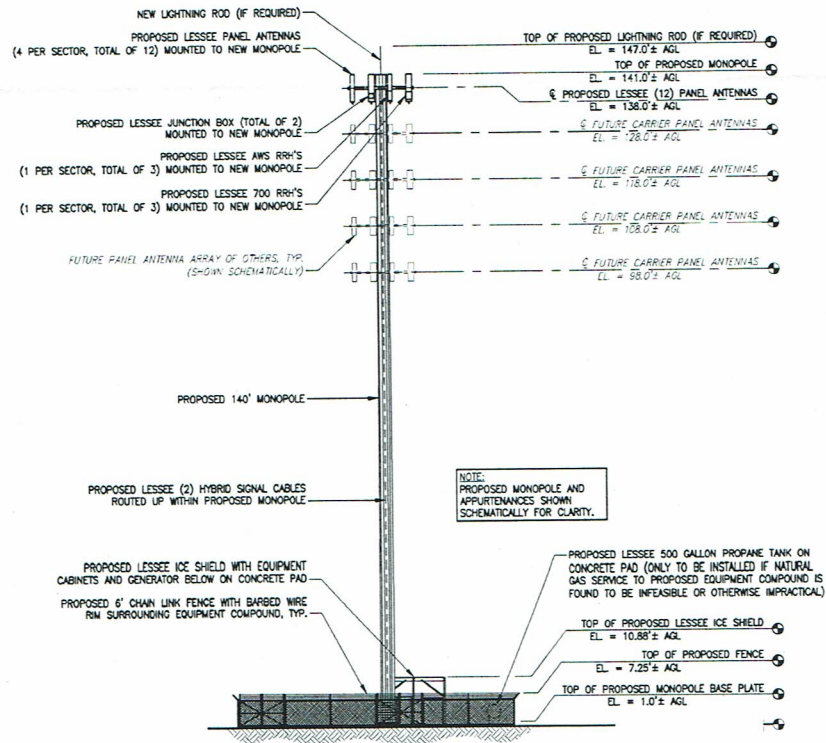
EXHIBIT B EXAMPLE OF TYPICAL INSTALLATION
